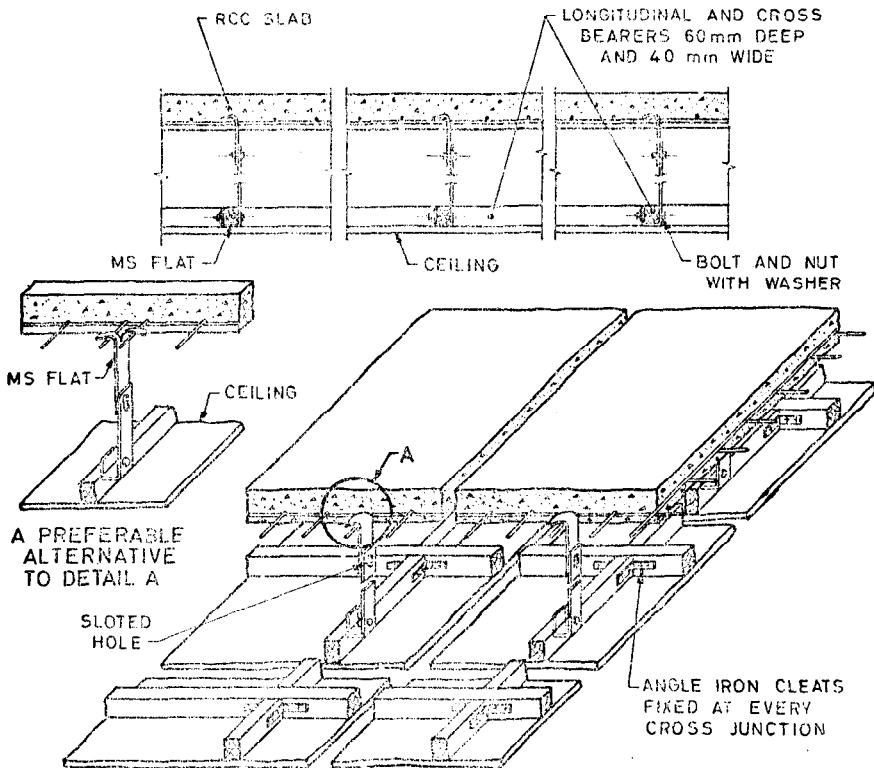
DETAILS OF CEILING FRAME SUSPENDED FROM RCC SLAB
